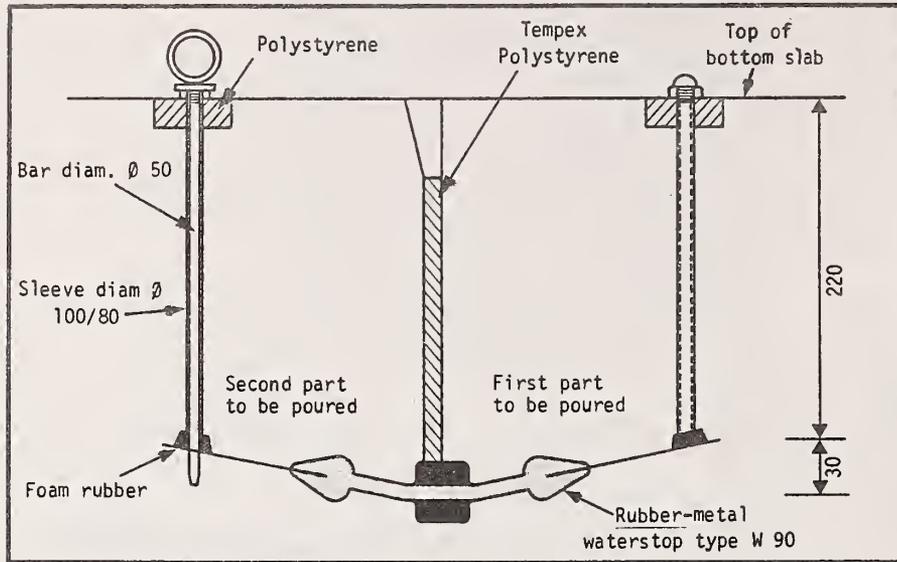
Detail A - EXPANSION JOINT WITH DUBBEDDAM RUBBER STRIP
